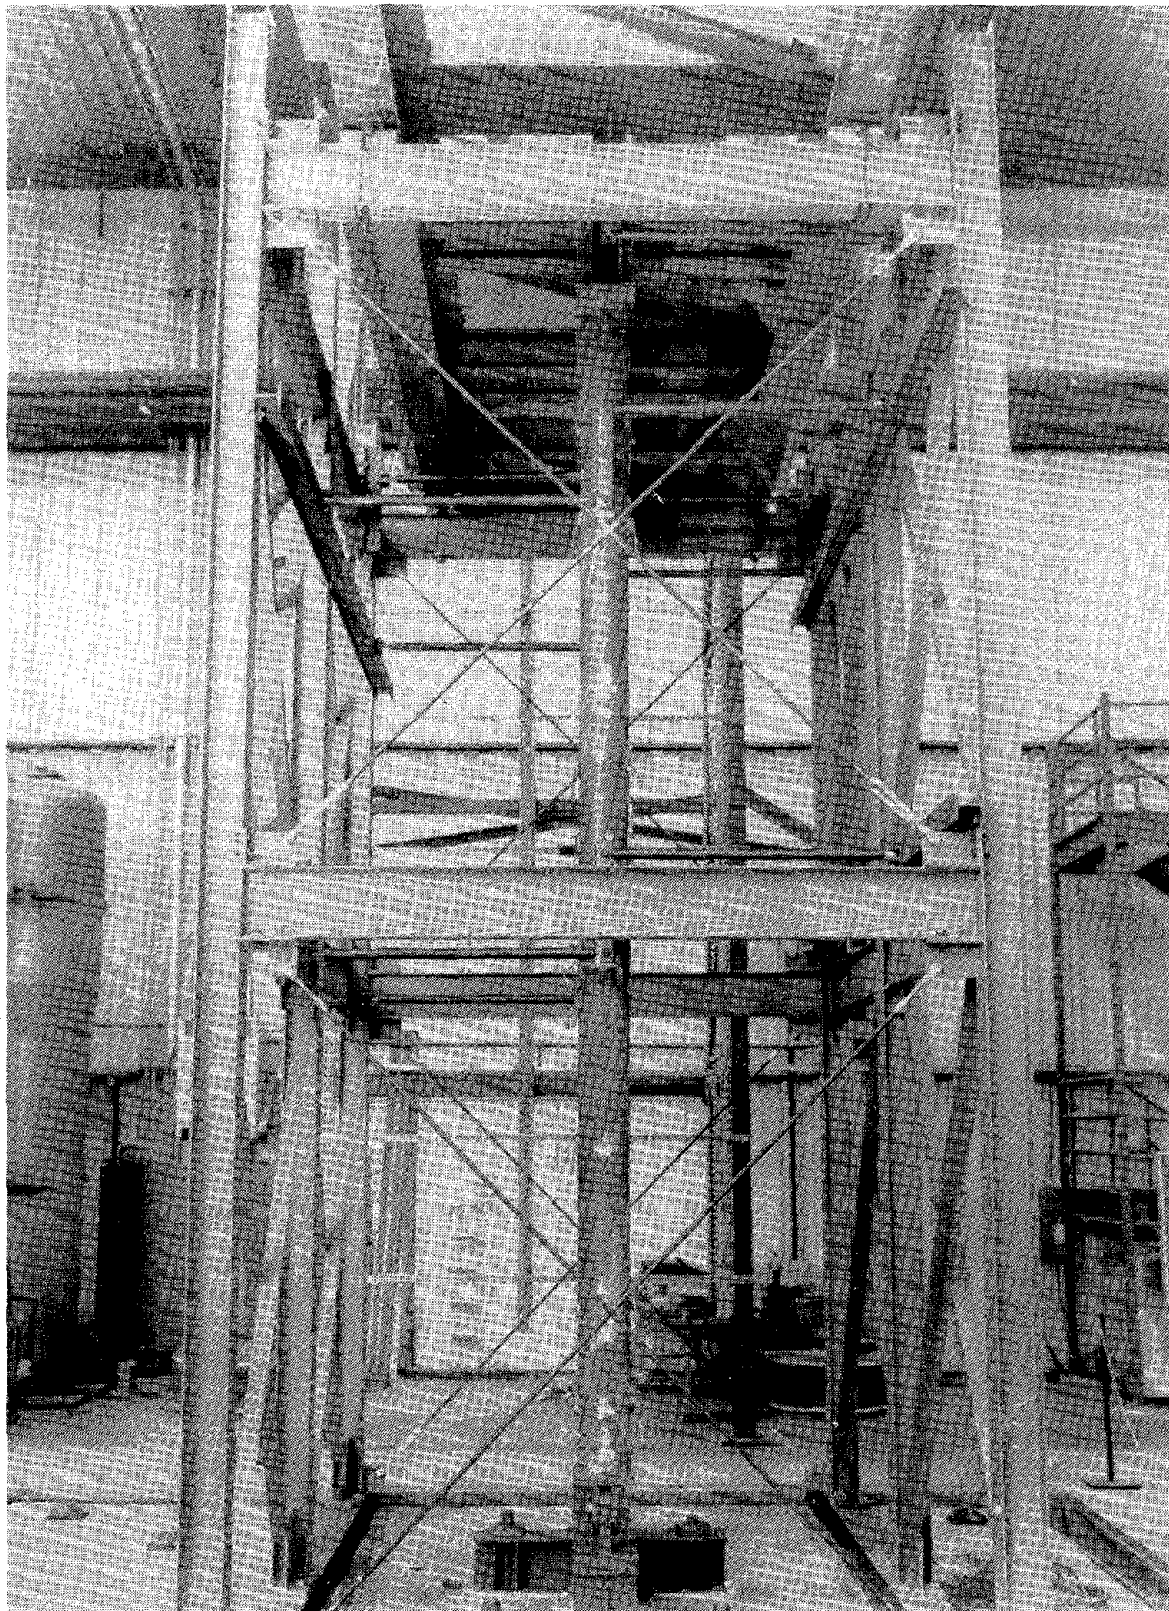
B Longitudinal View of Test Setup Showing Lateral Bracing of Test Model to Support Fixture.
